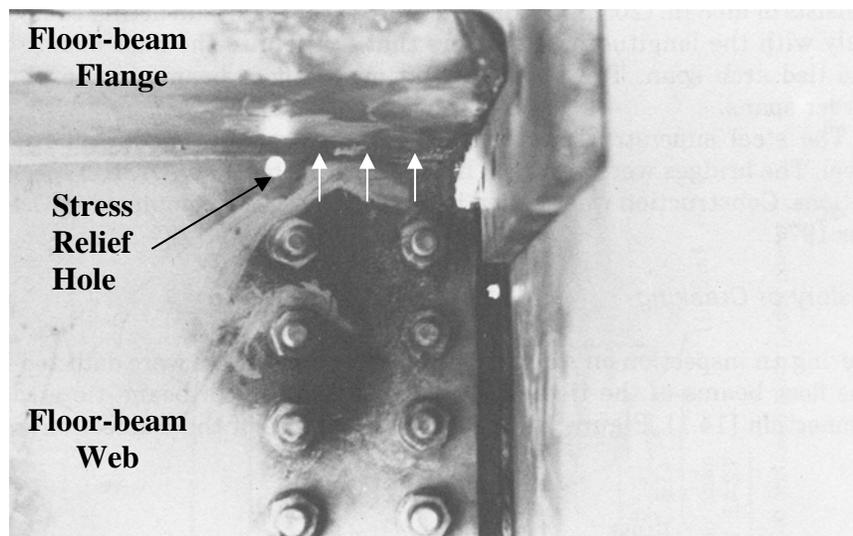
Cracking of floor-beam and floor-beam connection plate (Adapted from Fisher 1984)
